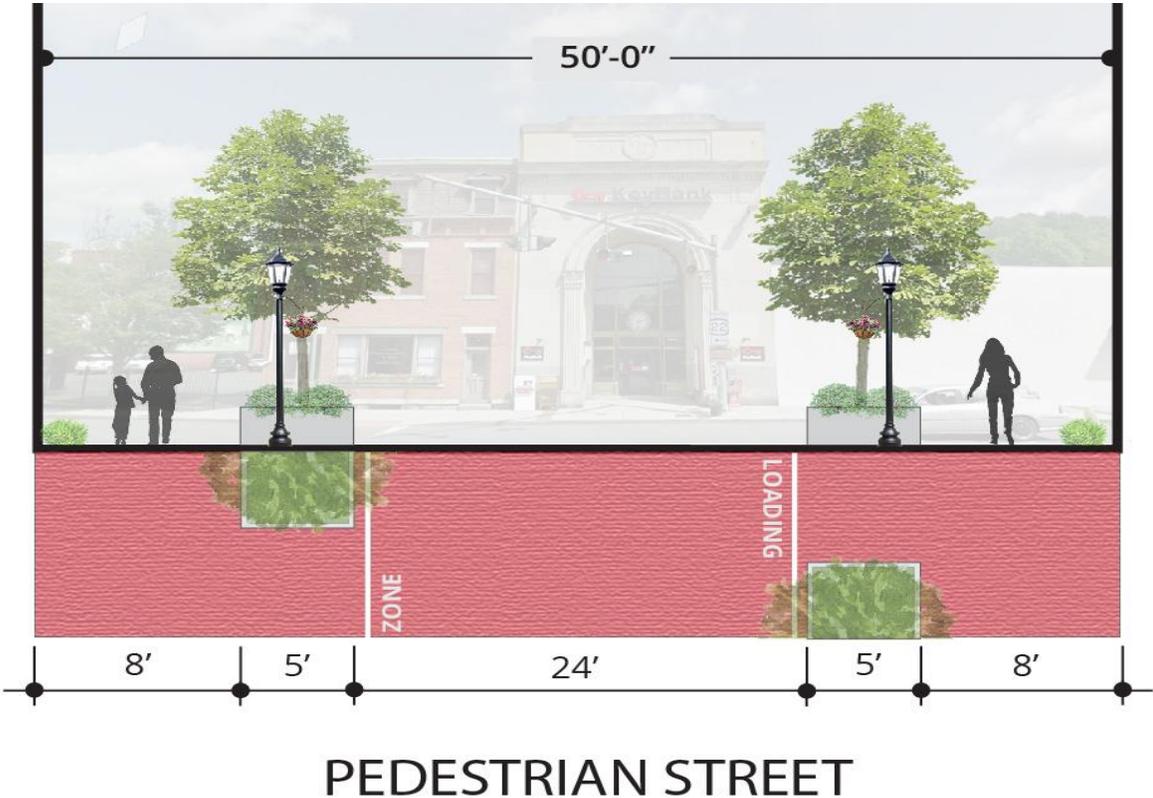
Potential street cross-section for John Street in Hoosick Falls
